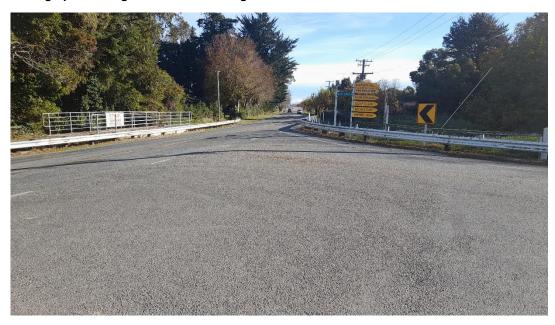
Golf Links Road Approach to Rangiora Woodend Road
